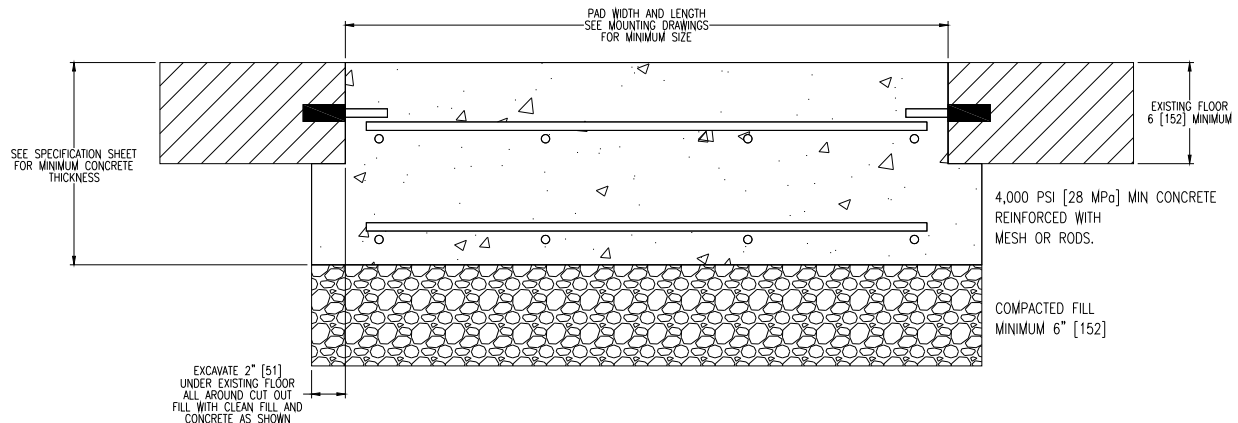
New Pad to Existing Floor(Level with Floor)
